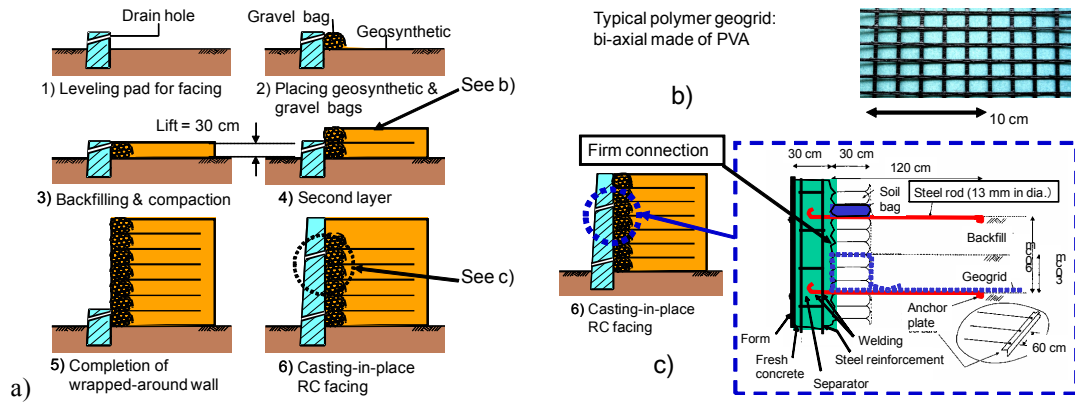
GRS RW with FHR facing: a) staged construction; b) a typical geogrid type; and c) facing construction at stage 6
